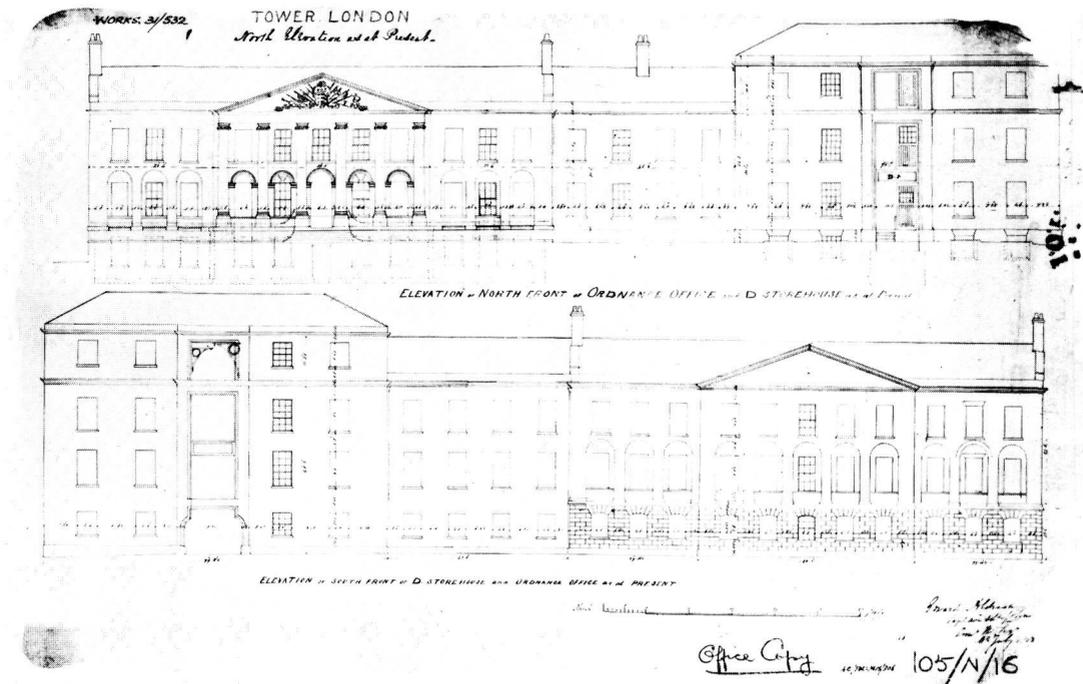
North and south elevations of Ordnance office and stores drawn in 1853.
